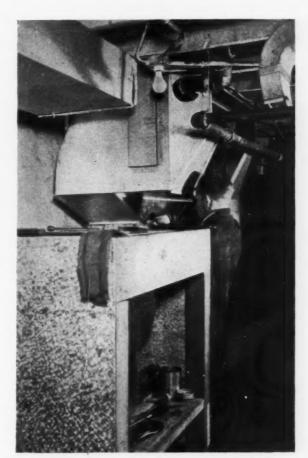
The heart of the Test House conditioning system is this assembled conditioner containing blower, motor, coils, filters.
